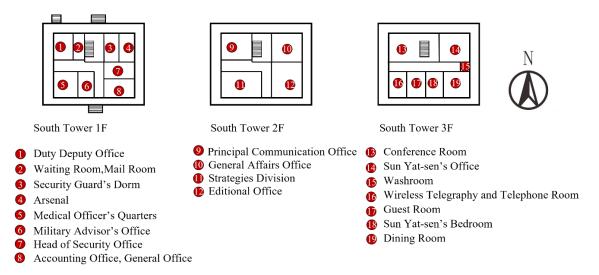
Floor Plan of the South Building of the Sun Yat-sen Grand Marshal's Mansion Memorial Hall (Source: Self-Drawn by the Author)
